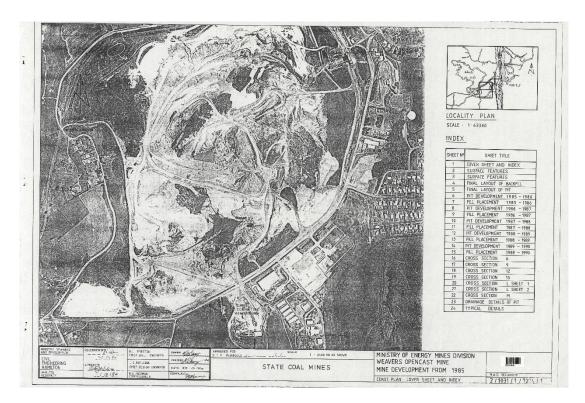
Weavers Open Cast Mine – Workings at 1985 including details of plans supplied.
